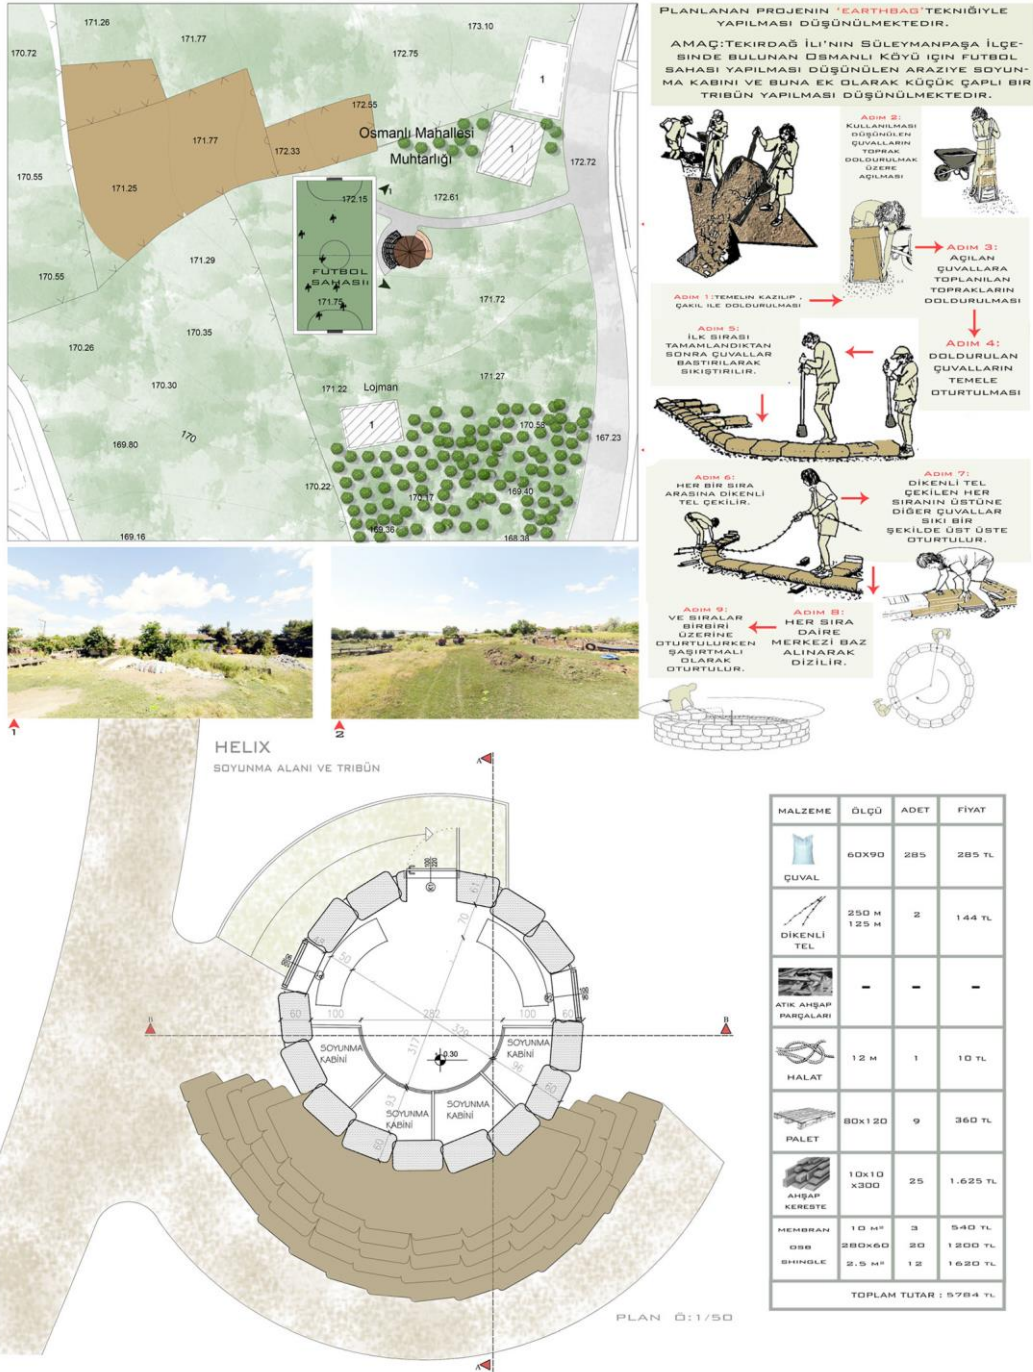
Alternative 2: Earthbag-roofed changing room and tribune layout, plan and waste materials used
